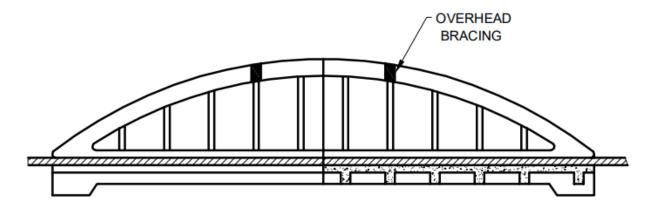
Classification of Concrete Arches Based on Construction Typical-Tied Arch or Bow-Strings Girder
